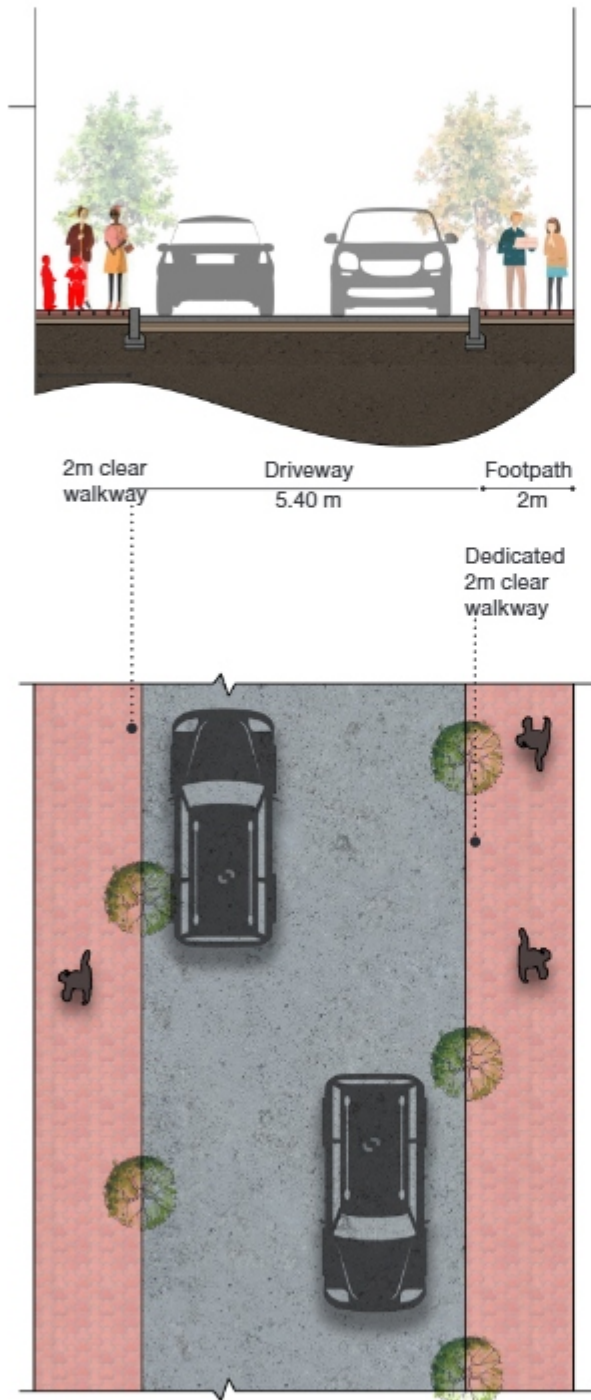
9 metre local street section and plan with two-sided footpath and two-way traffic
